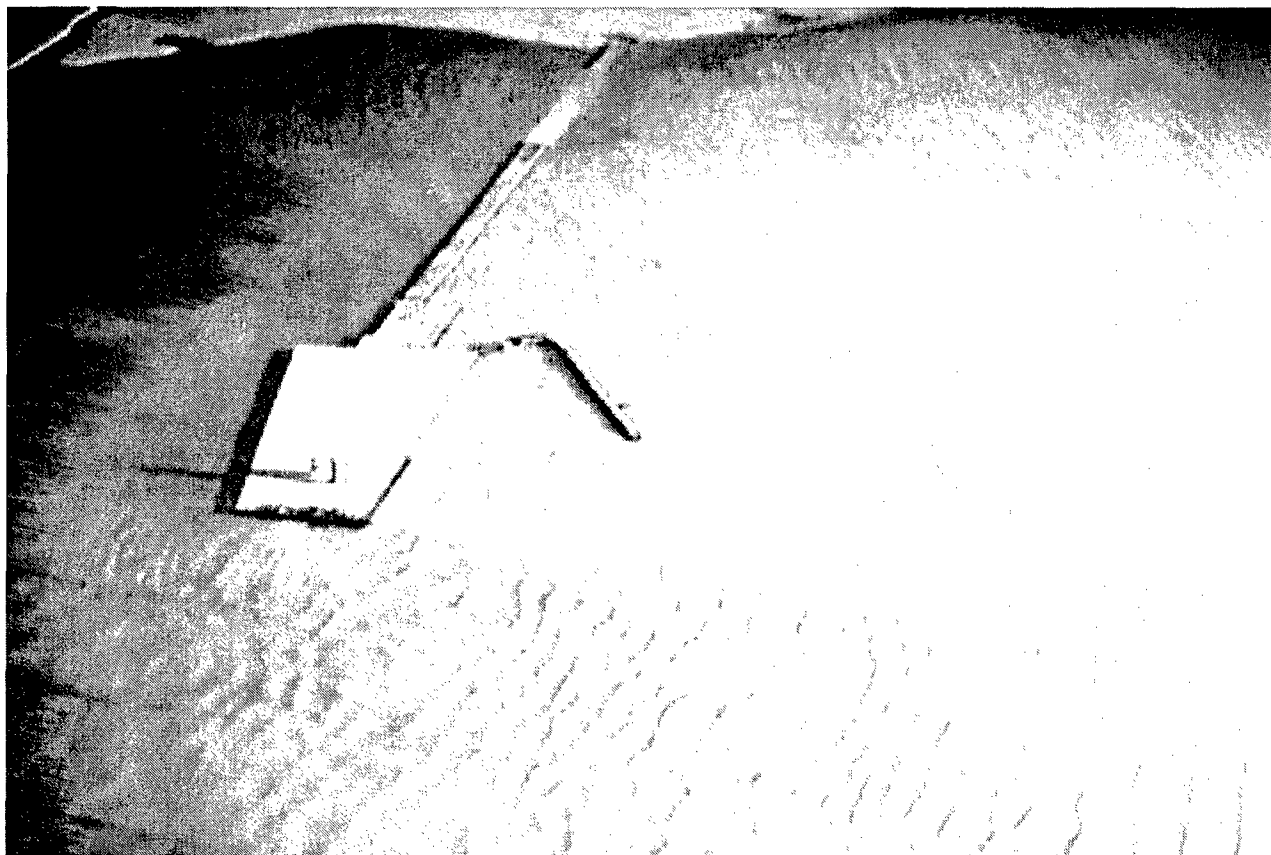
Typical wave patterns for Plan 5; 4.7-sec, 1.2-m (4-ft) waves from 90 deg
